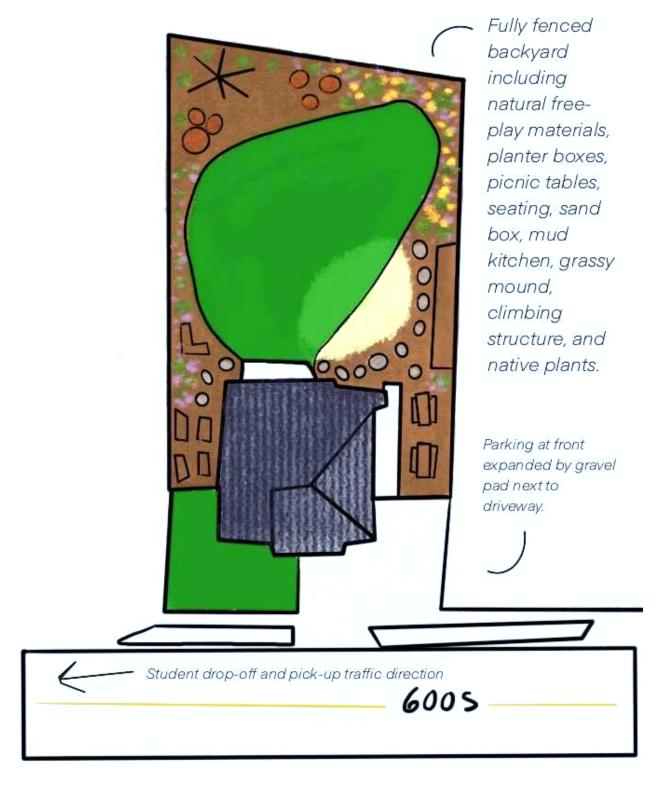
Image C: Property Site Plan - Proposed landscaping for backyard, Employee parking in front, Drop off/pickup site
